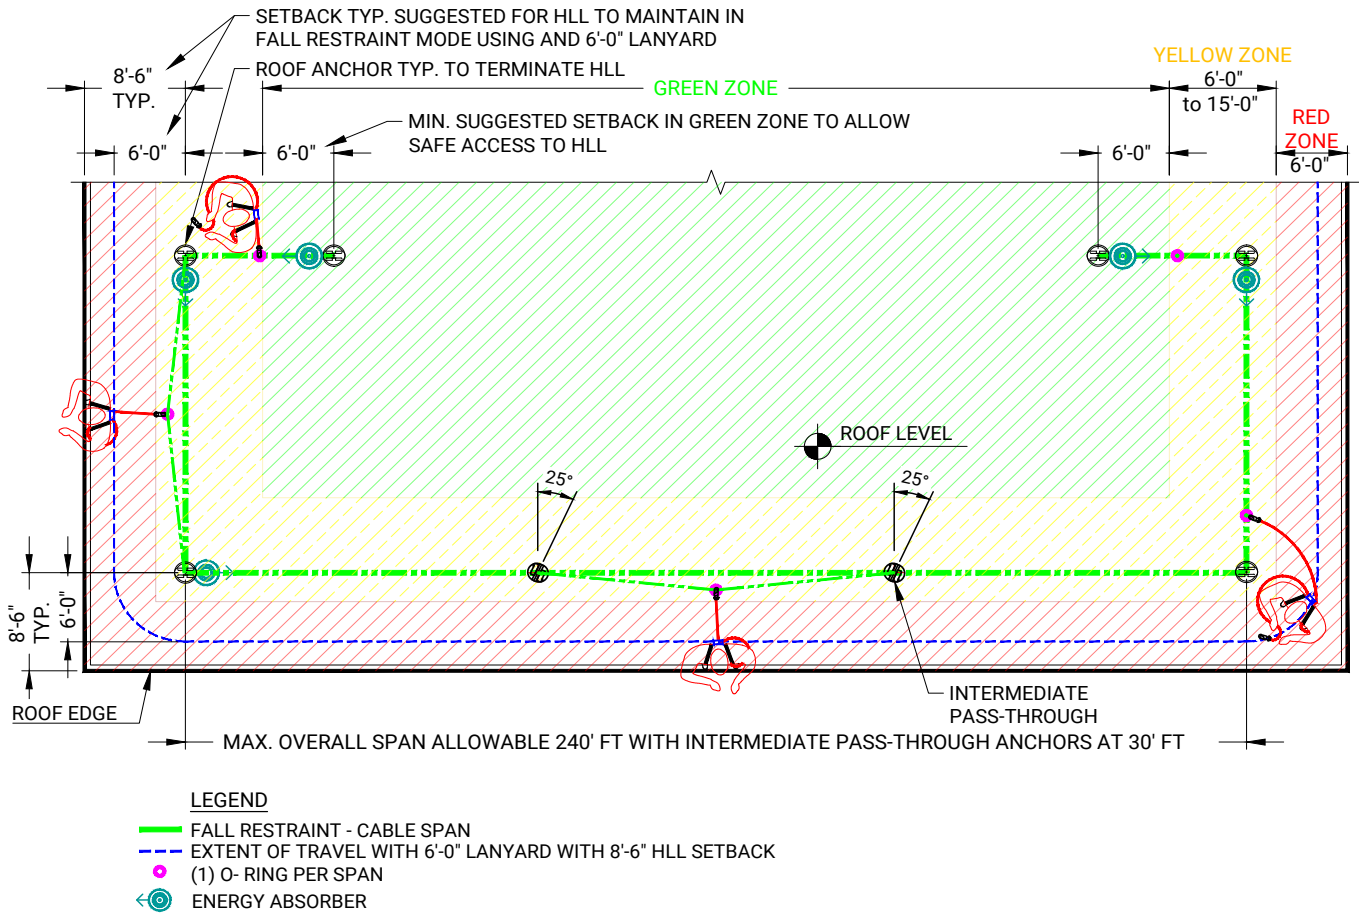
plan view with pass-through anchor eyes using a double lanyard system.
